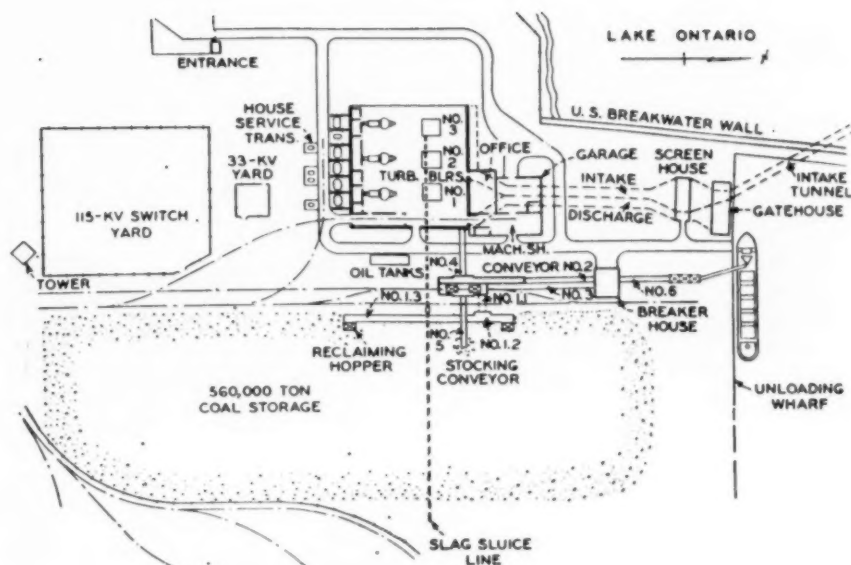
PLAN OF COAL-HANDLING SYSTEM, OSWEGO STEAM STATION
